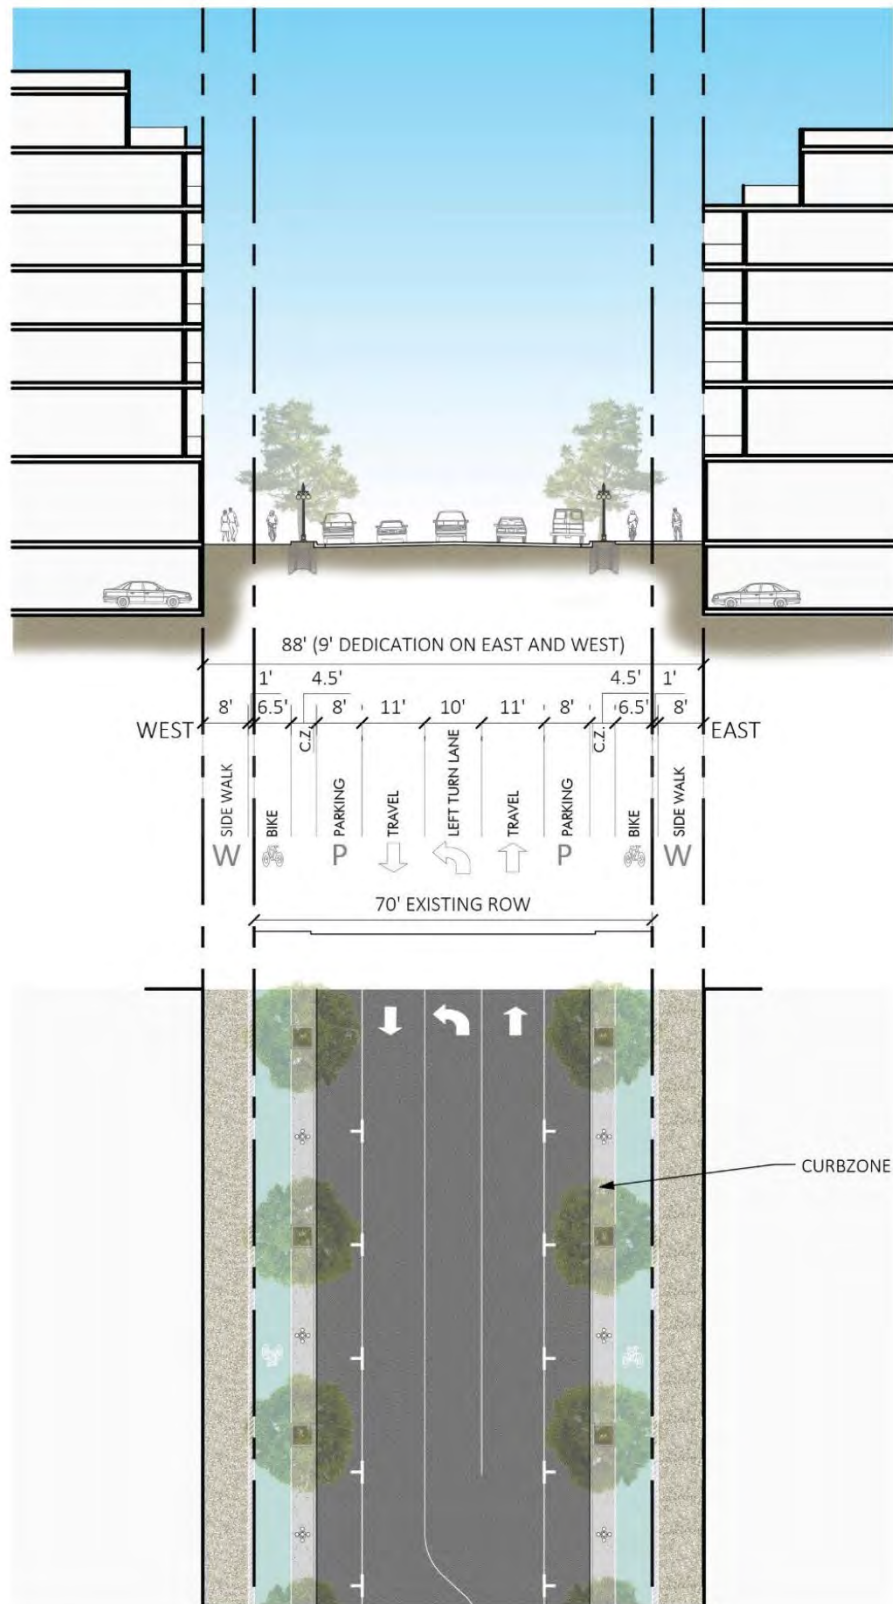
Front Street Between Spruce Street and Laurel Street Extension (4)
